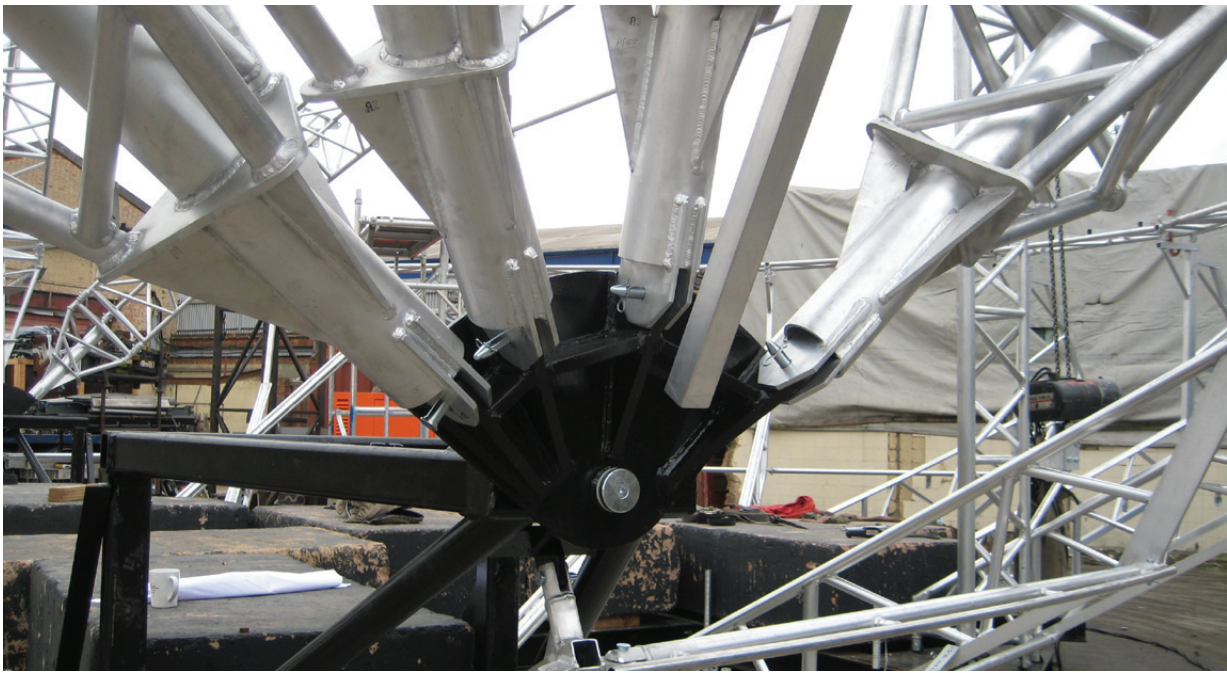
Photograph of the pram lid joint during the test assembly.
